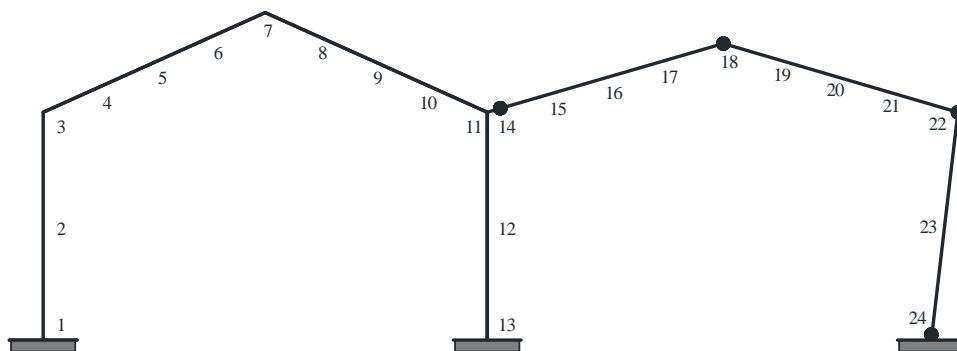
A two-bay pitched roof portal frame: Actual collapse mechanism
